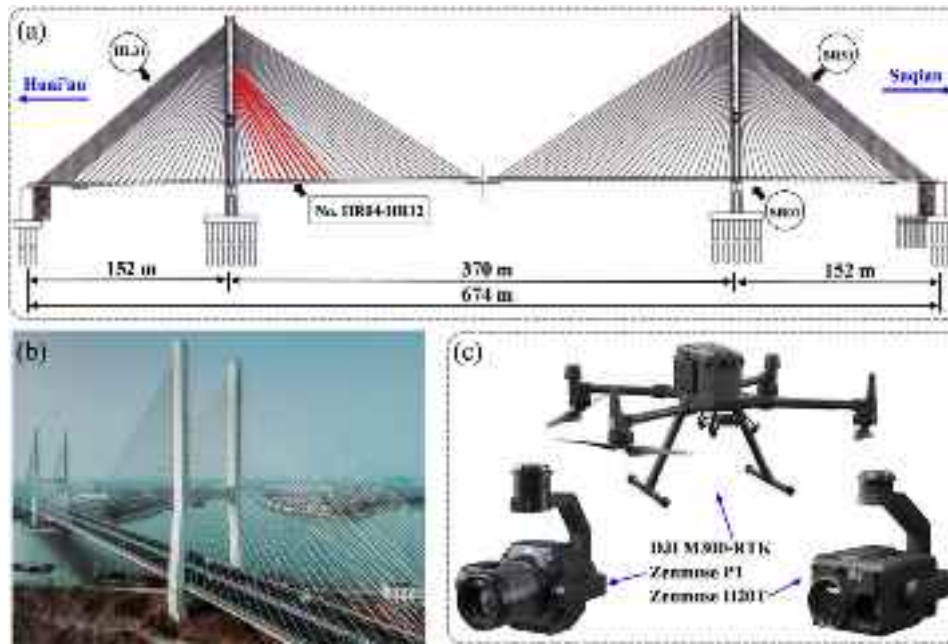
Field test information: (a) Schematic diagram of facade layout of tested bridge; (b) Real-life picture of tested bridge; (c) UAV and cameras.
